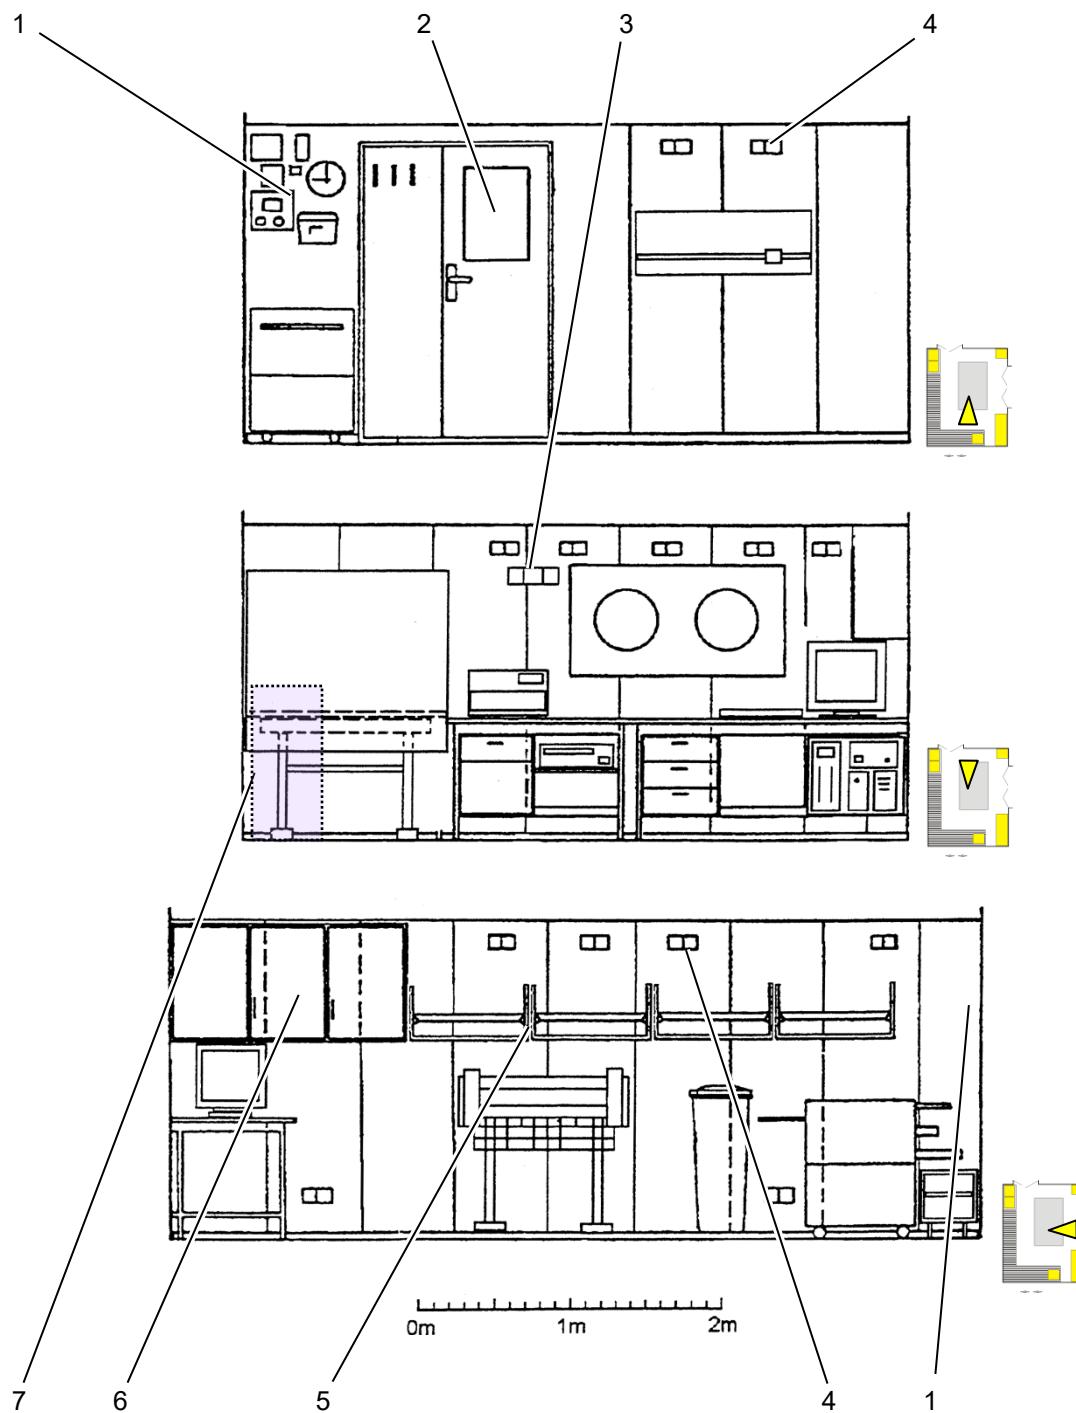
Drawing room 13 (detailed plan of laboratory walls, version 1986)
